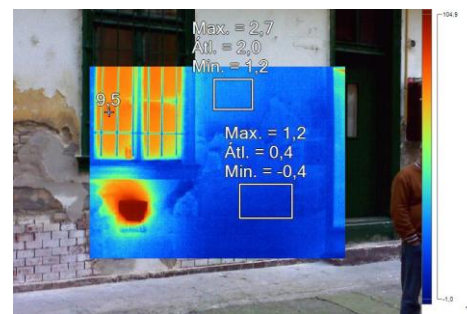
Façade (facing courtyard) with window and wall-mounted gas convector flue exhaust
